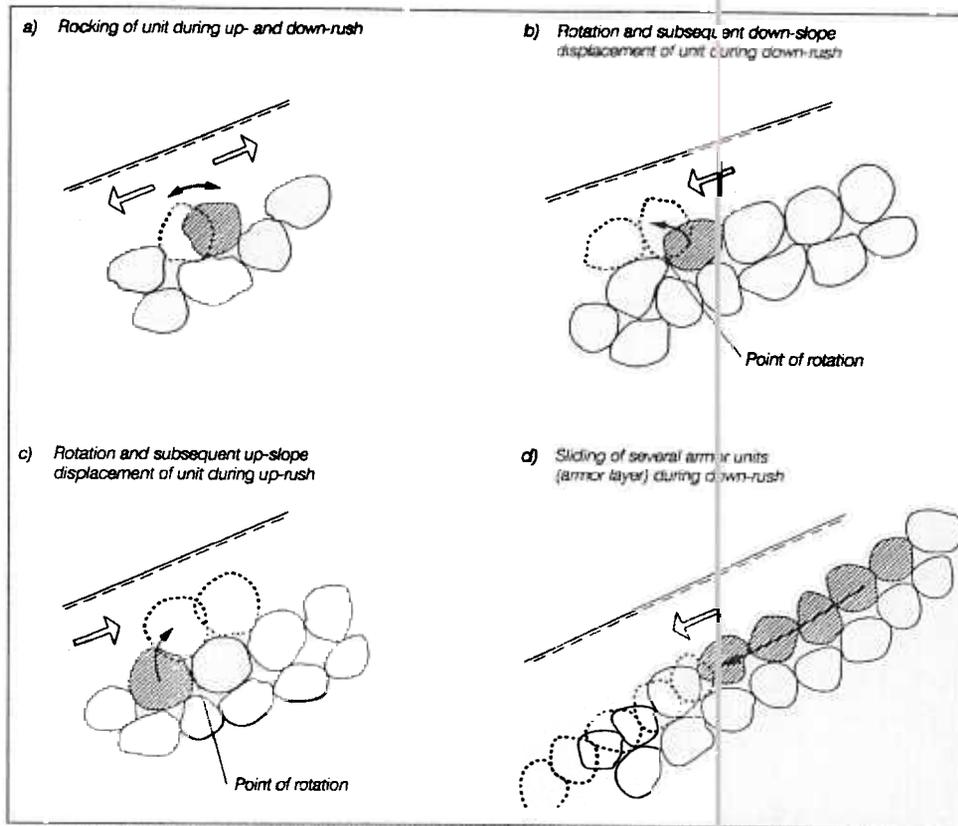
Examples of typical failure modes of armor layers due to hydraulic instability.
